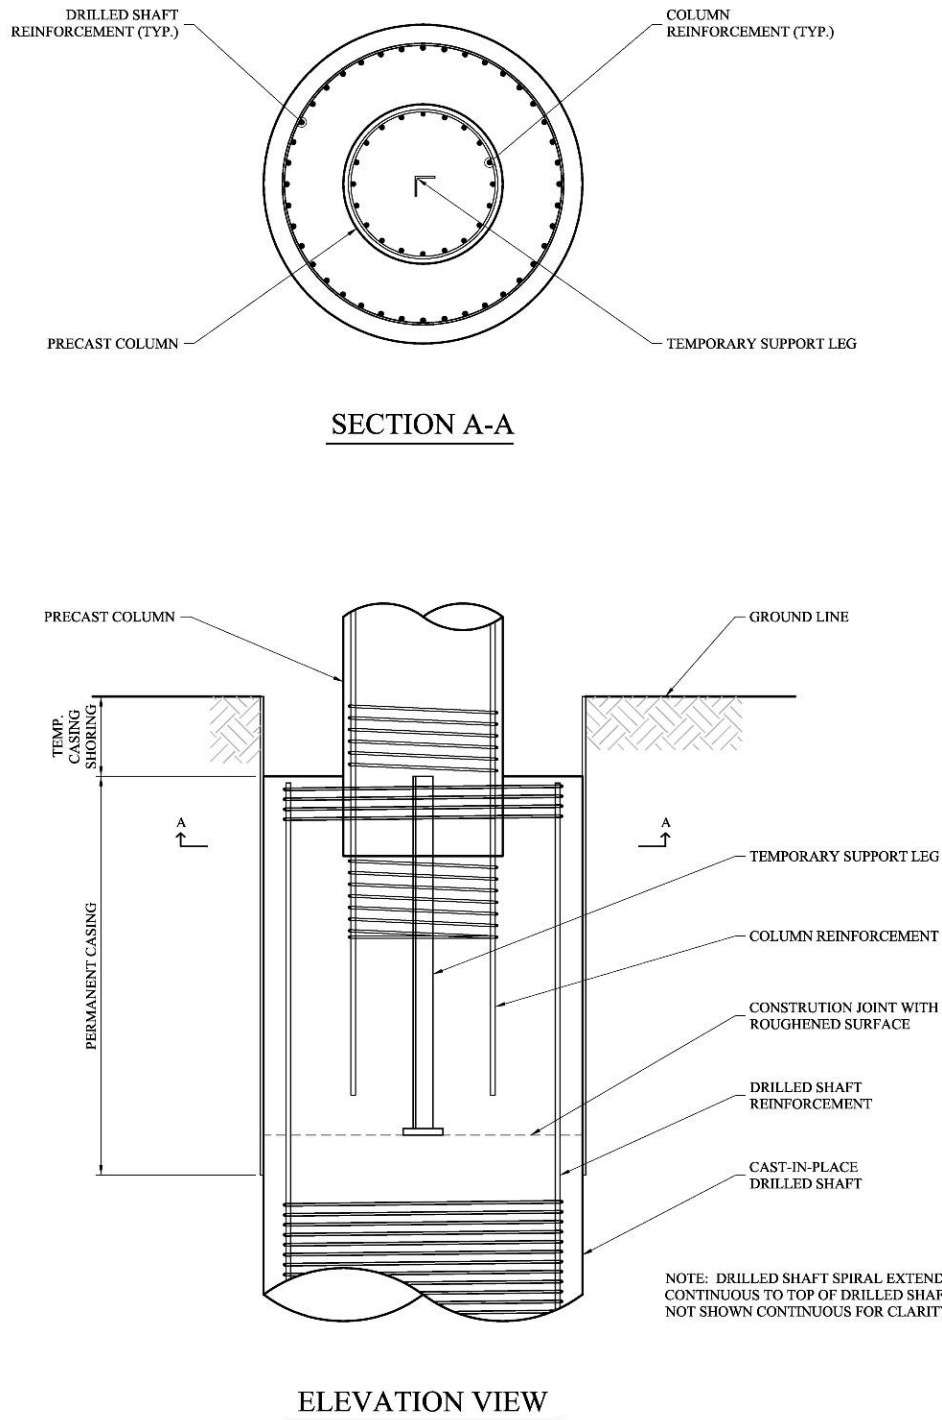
Proposed Footing-to-Column Connection for Reinforced Concrete Frames
